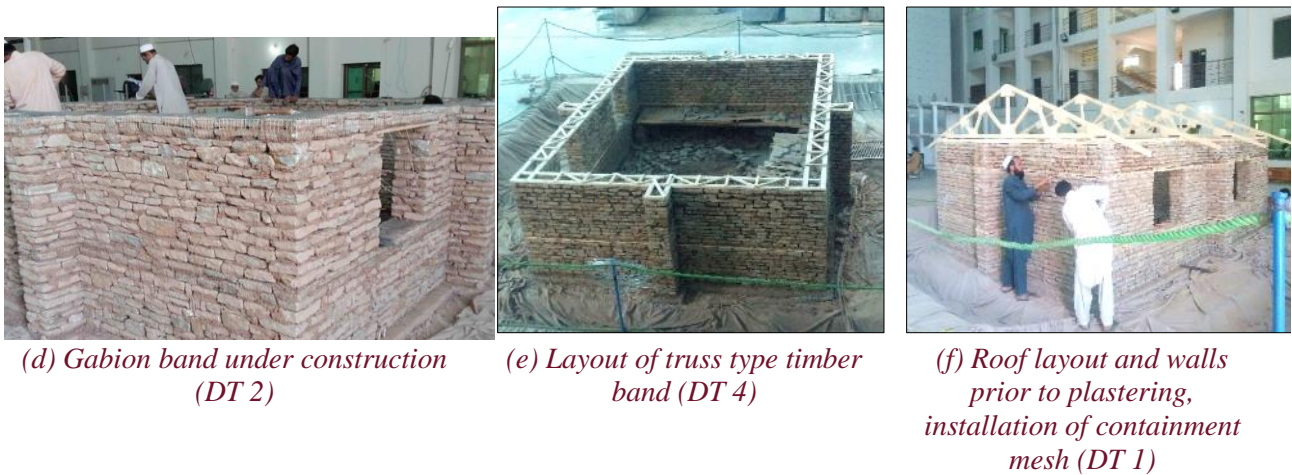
Snapshots of model buildings (2/3rd scale) construction
